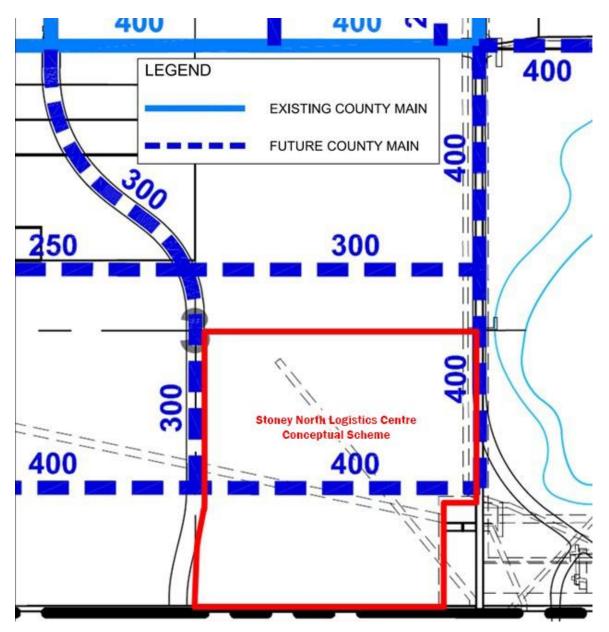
Water Mains, Balzac Master Potable Water Plan Update
